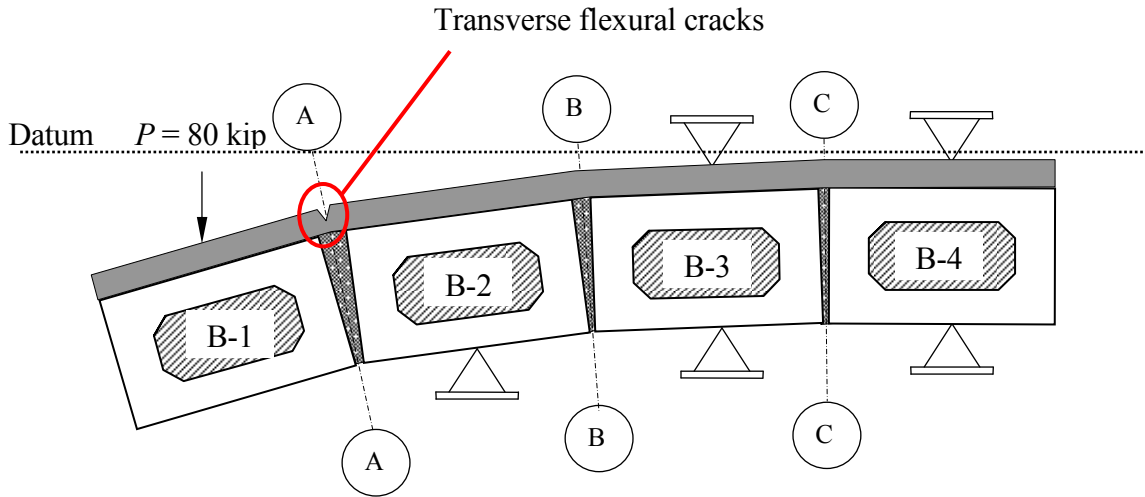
Bridge deformed shape due to applying vertical load at beam B-1.
